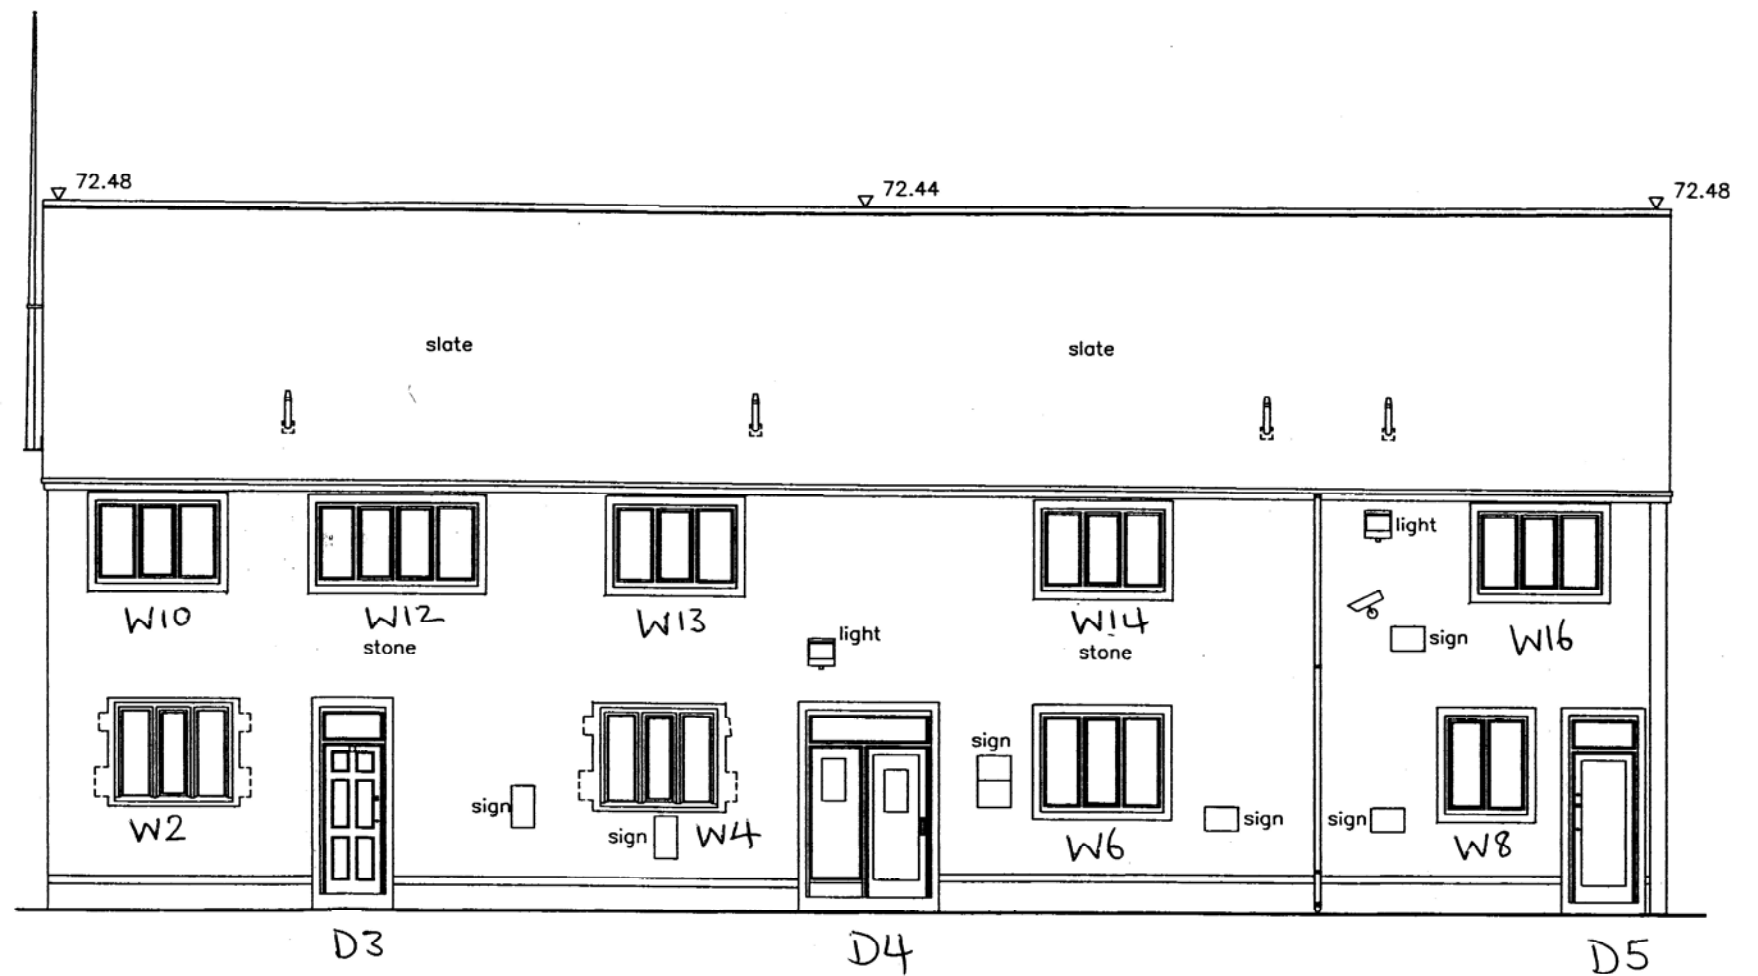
Free Grammar School, Highcross Street, Leicester. Scale 1:100. West (Highcross Street) elevation showing location of openings to investigate window & door surrounds. Numbering of windows and doors follows that of RG+P.
